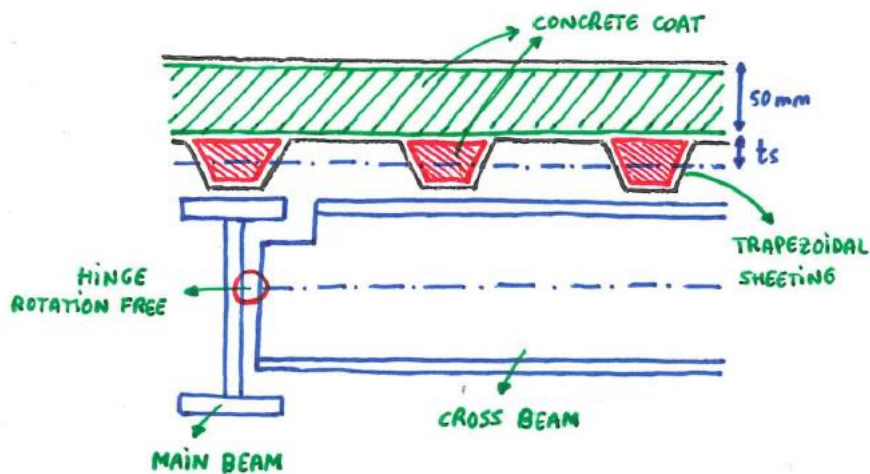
scheme of arrangement between main & cross beam & trapezoidal sheet.
